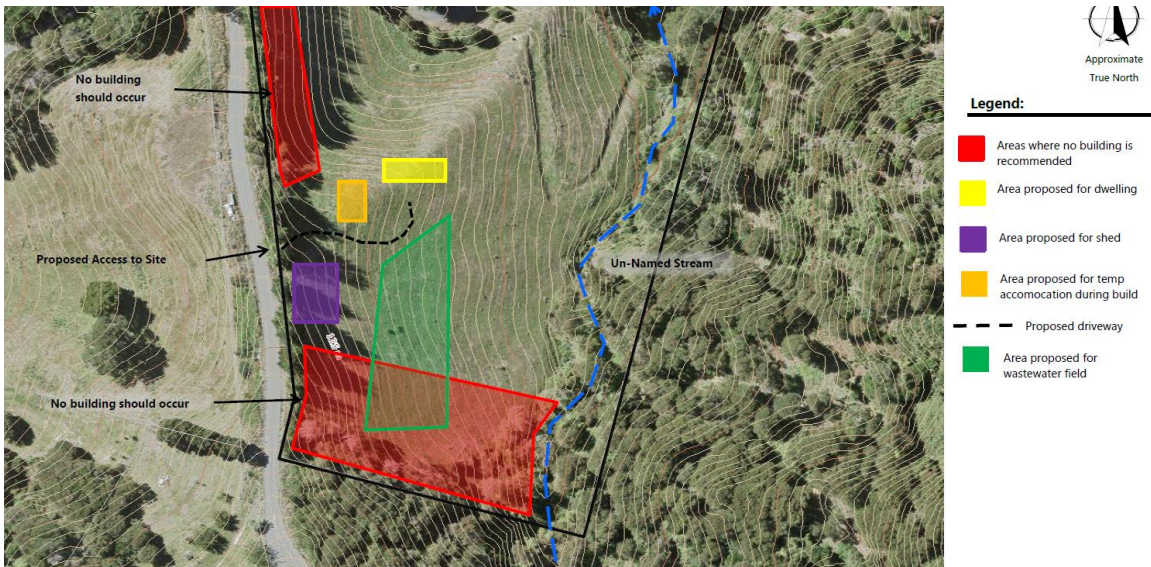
Proposed building locations (See CGW Site Suitability Report)
